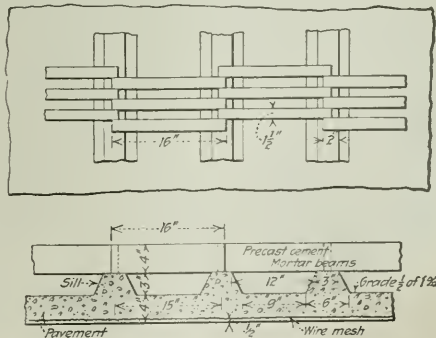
DETAIL OF TRICKLING FILTER FLOOR
